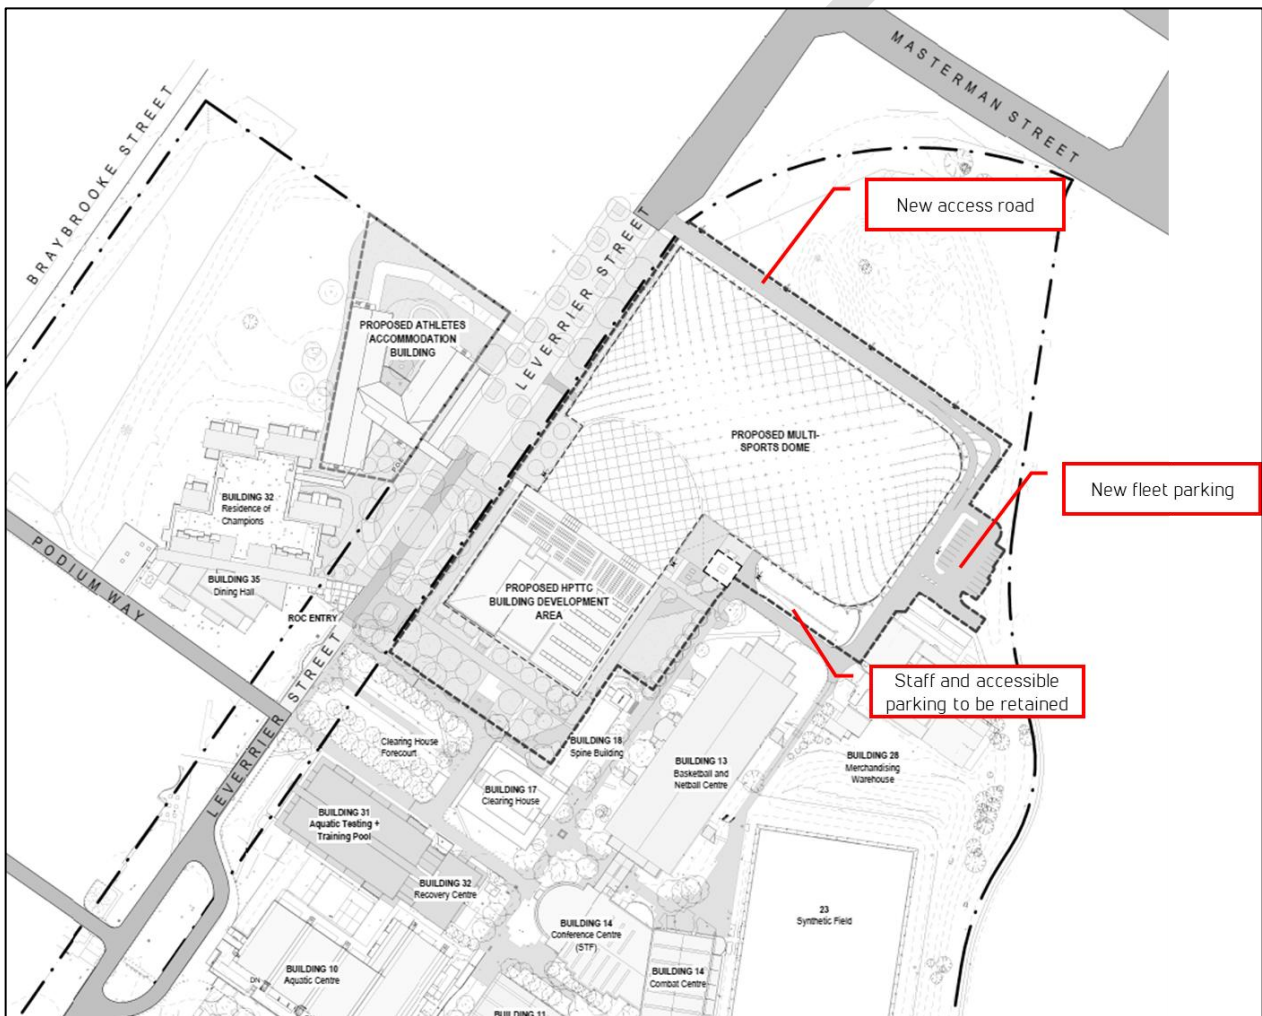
Proposed site plan (source: Populous Proposed Site Plan AT-16-0002(B) dated 3/11/25)
